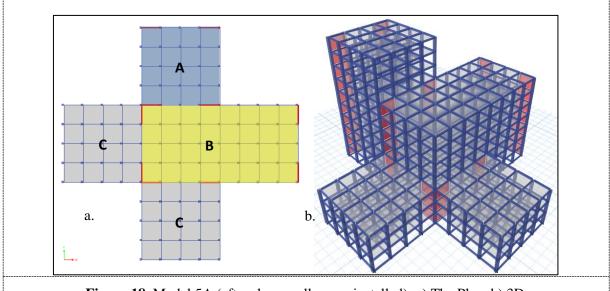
Model 5A (after shear walls were installed): a) The Plan, b) 3D.
